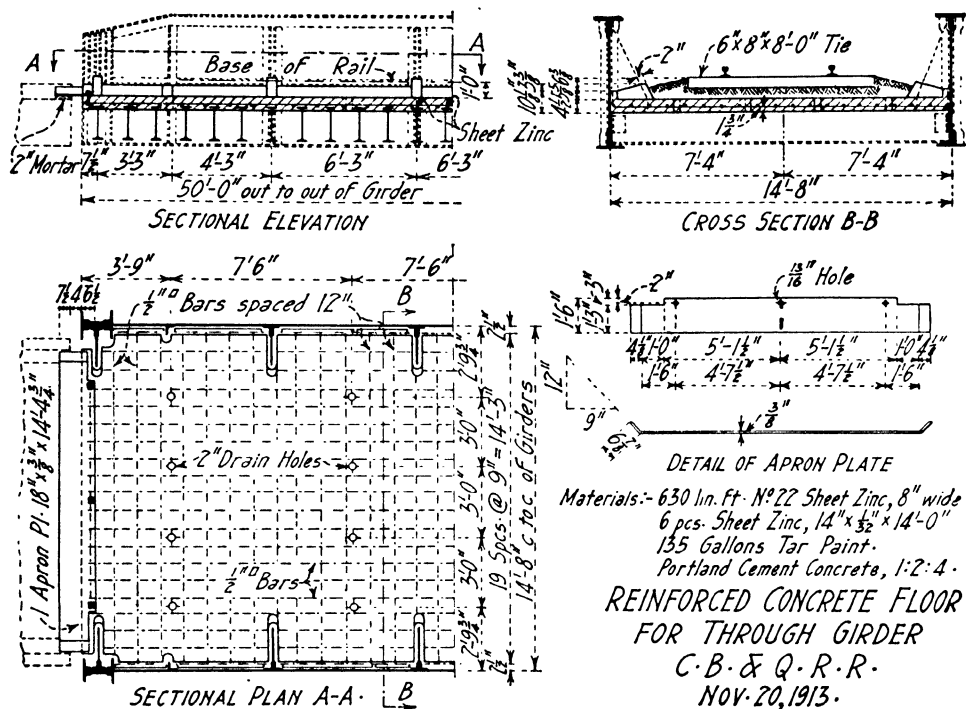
REINFORCED CONCRETE FLOOR FOR THROUGH PLATE GIRDER BRIDGE.
